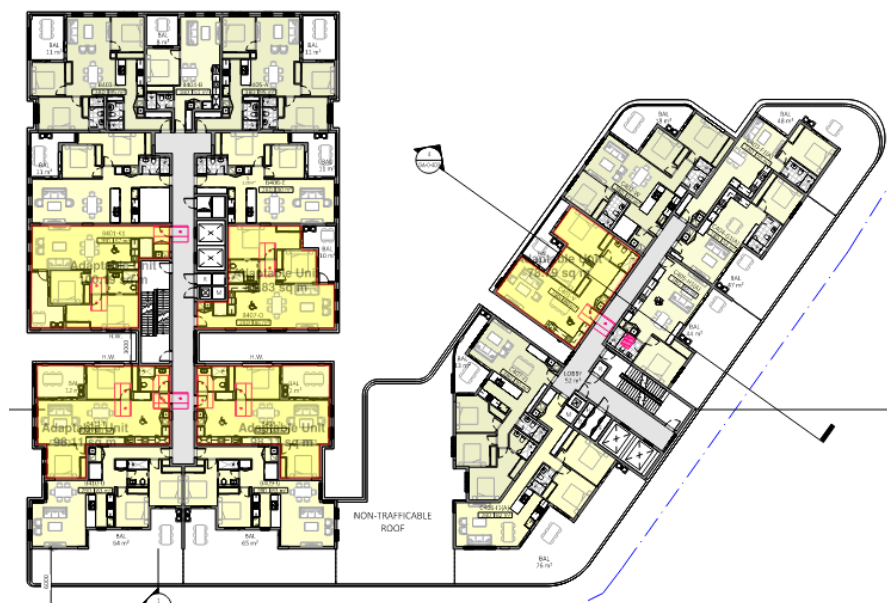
Level 4-5 Floor Adaptable Units Location on Architectural Plans
